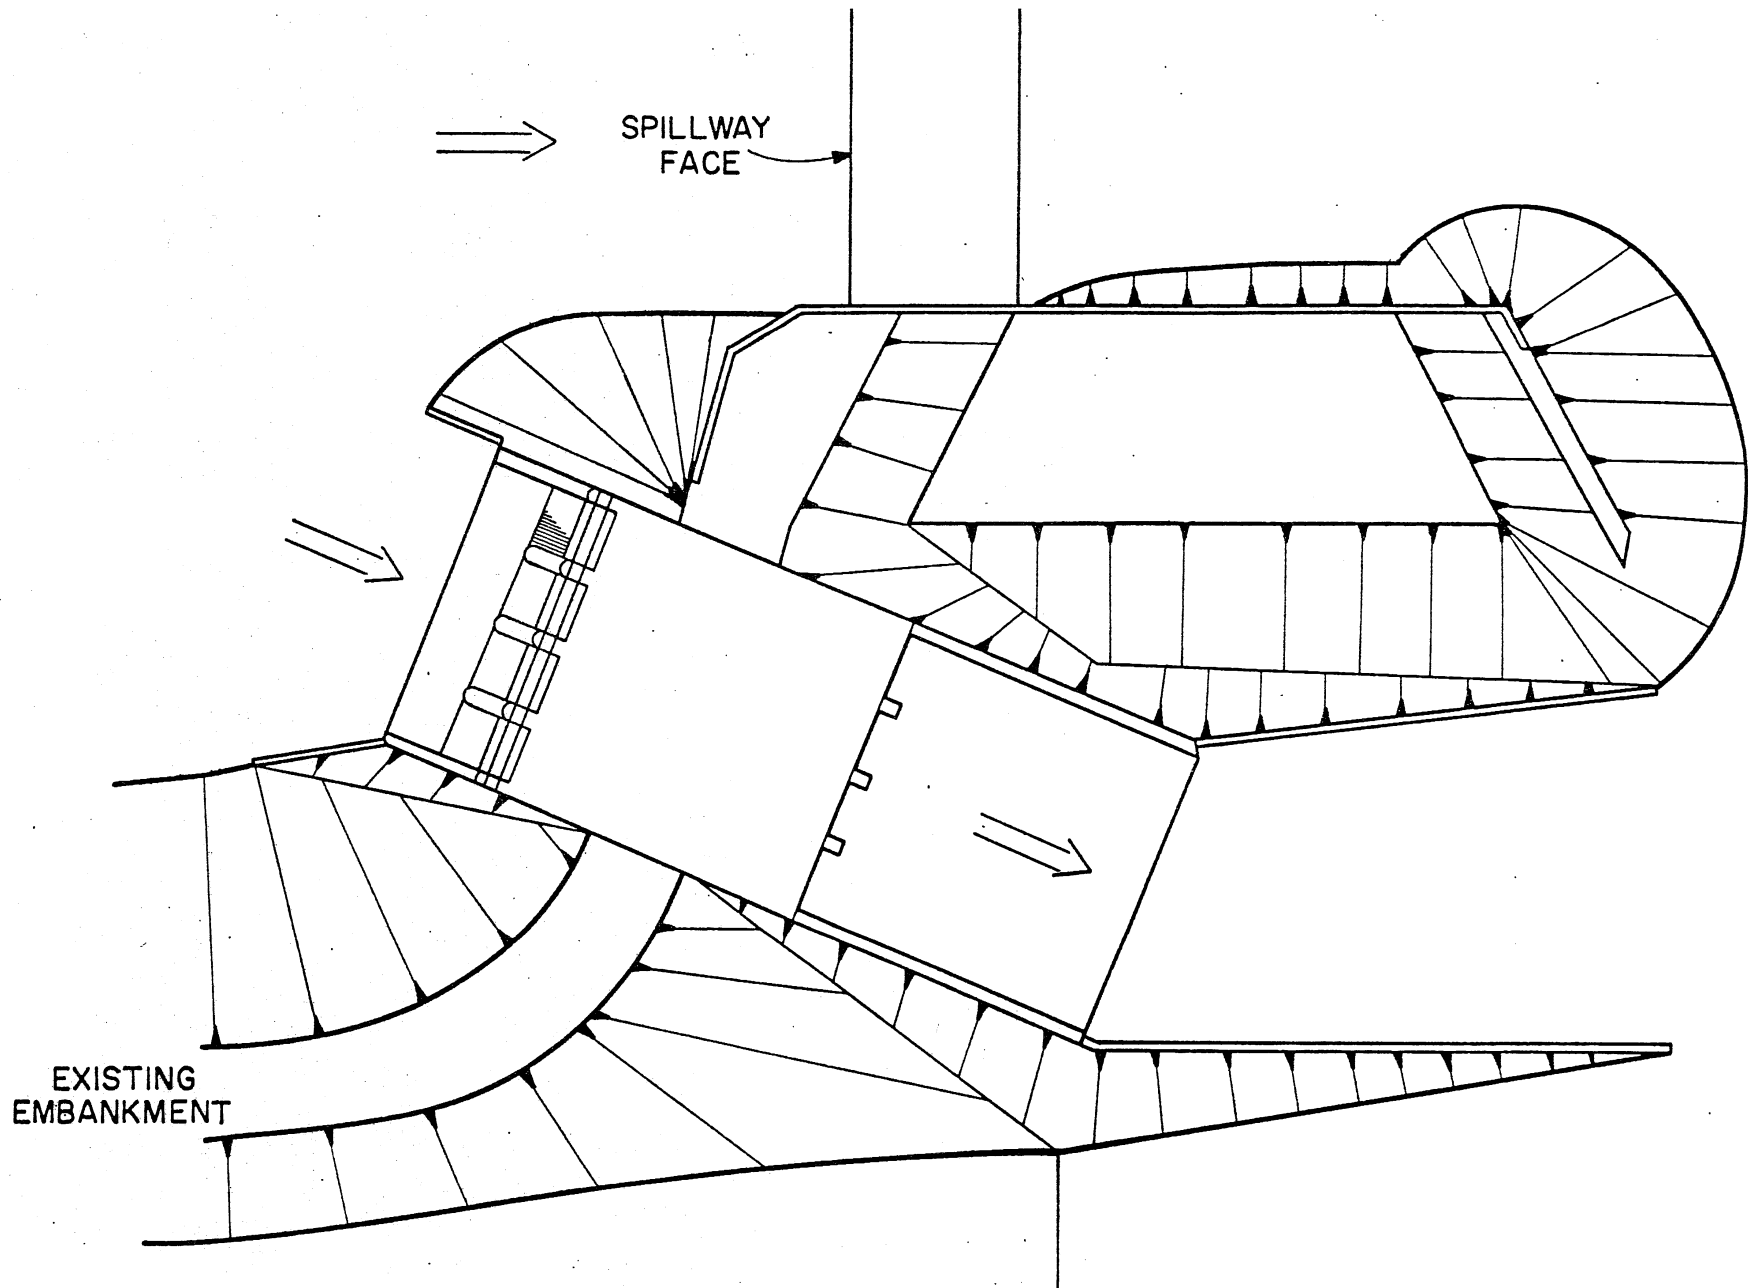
Plan View Showing Powerhouse with Four Horizontal Units in Right Earth Embankment.
